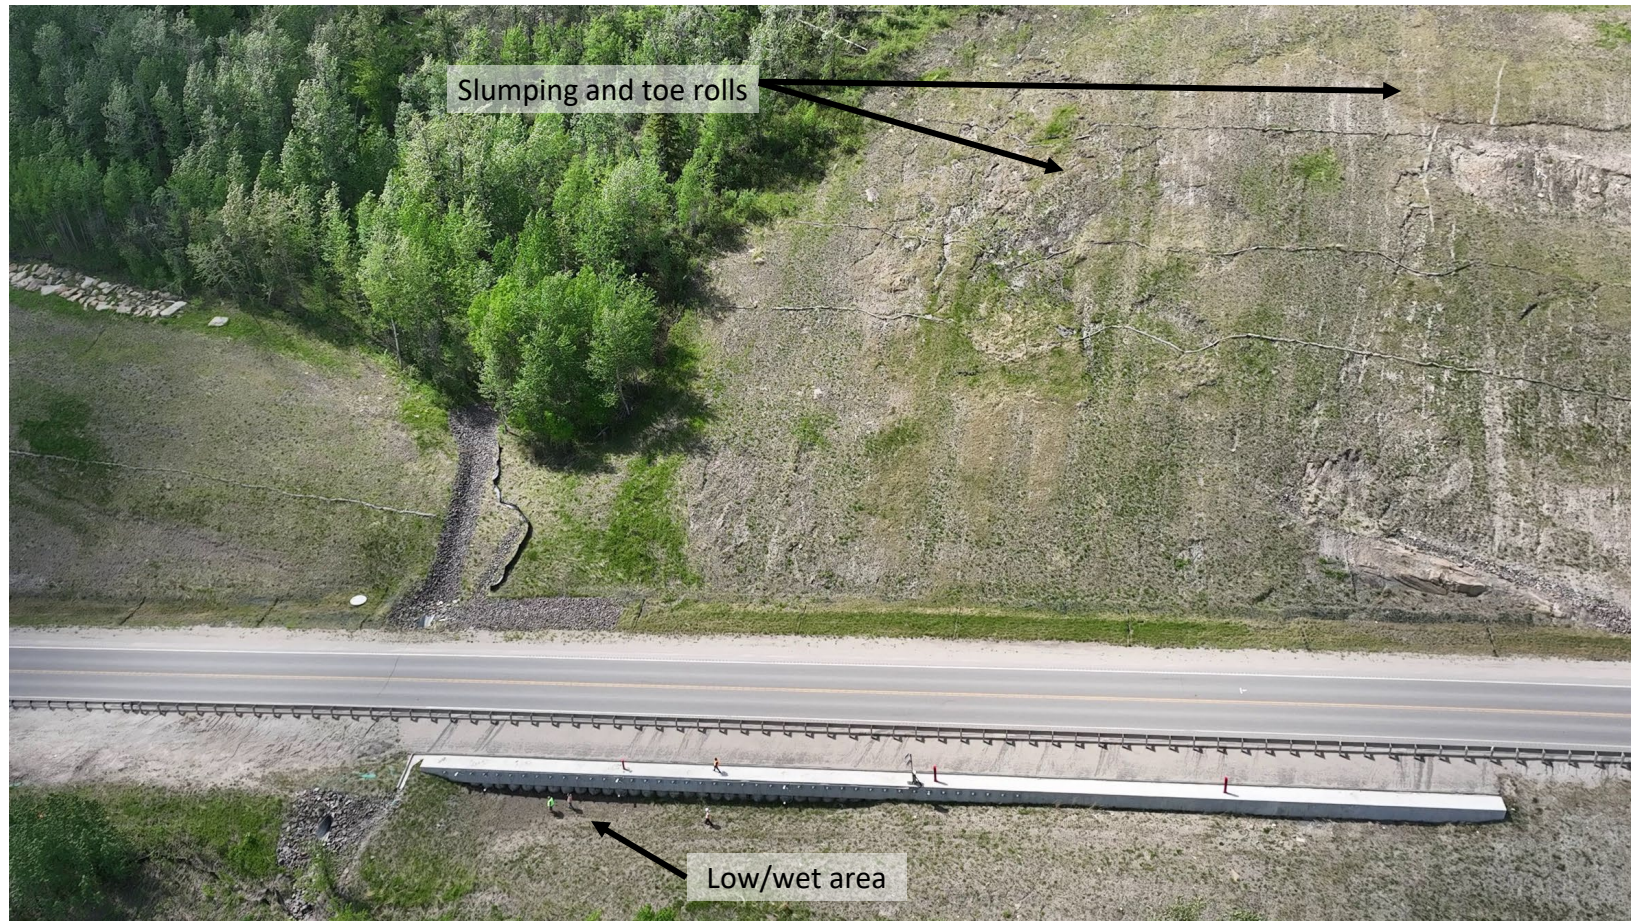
North portion of site. Note binwall and three pile walls on east (downslope) side of Hwy 40:36, and slumping and toe rolls on west (upslope) side of Hwy 40:36. UAV photo taken June 2, 2025, facing northwest.
